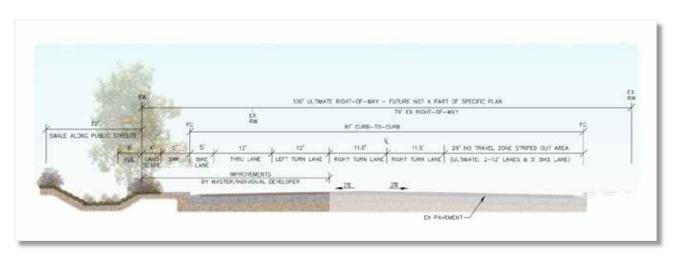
Internal Backbone Streets Street "A" & the Extension of Dayton Street on the East Side of Street "A" (no parking allowed)
